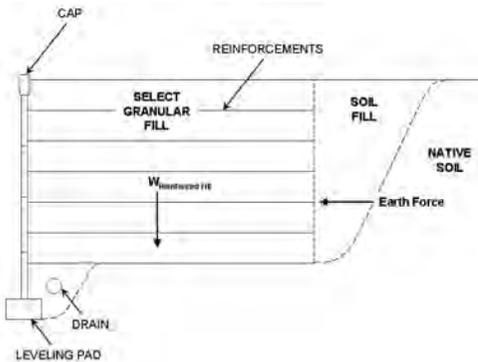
Reinforced Soil (MSE) Overturning Earth Force
